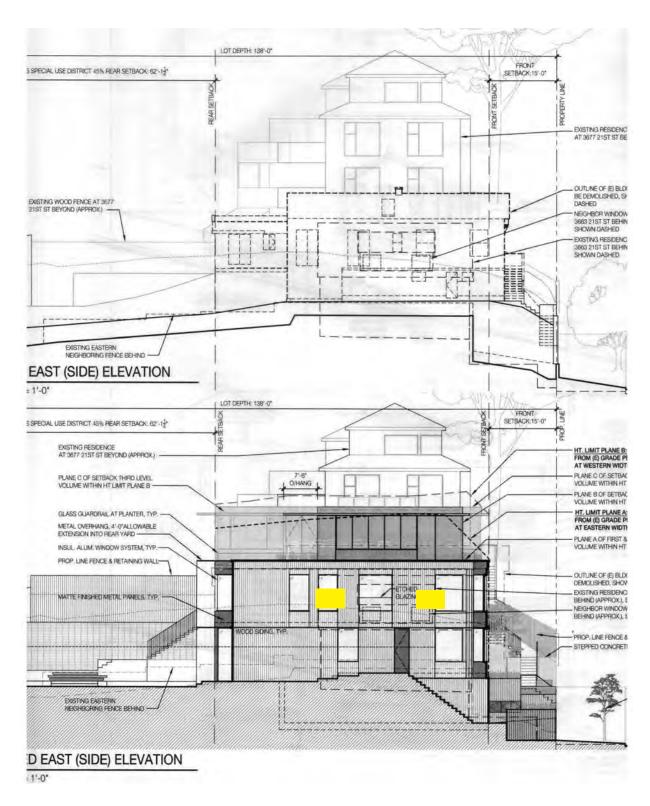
, detail of 3669 21st Street proposed site plan side elevation, sheet A-6, with approximate locations of 3663 21st Street second-floor windows shown in yellow. While existing property also had facing windows, there was privacy through a lot's distance and plantings.
